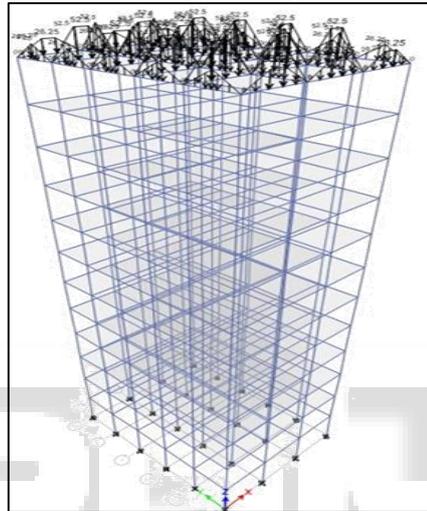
3D view of Frame with lumped mass at 12th floor
